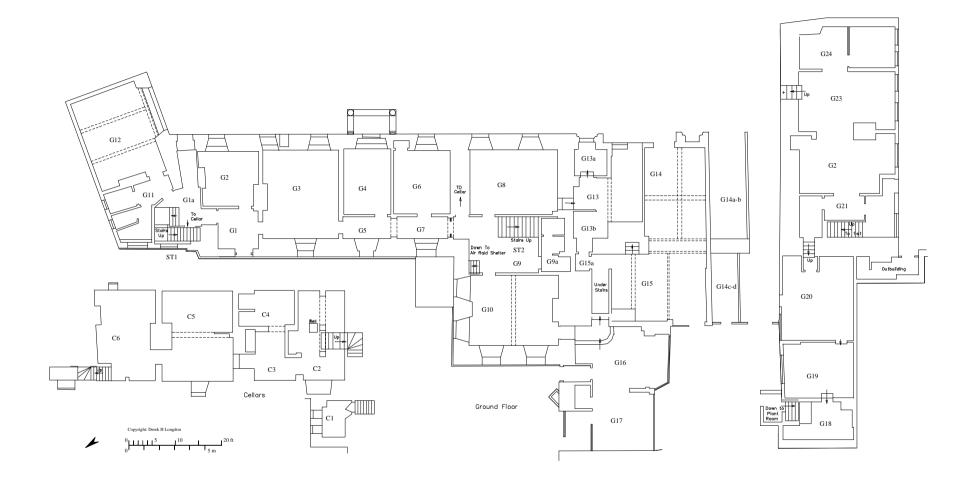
Abbey Gate: ground floor and cellar plans, showing room numbering
